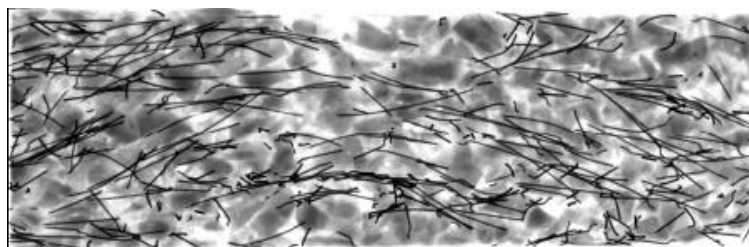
X-ray photo of SFRC specimen's cut section[2]
